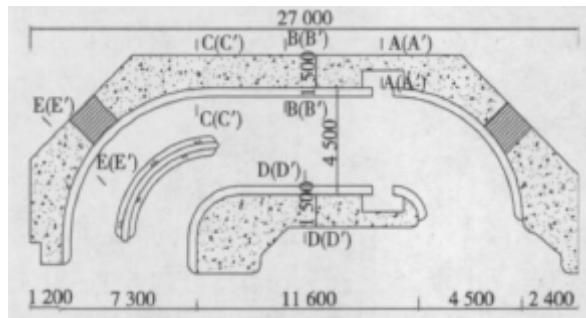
Observation section and arrangement diagram of culvert post-poured strip
